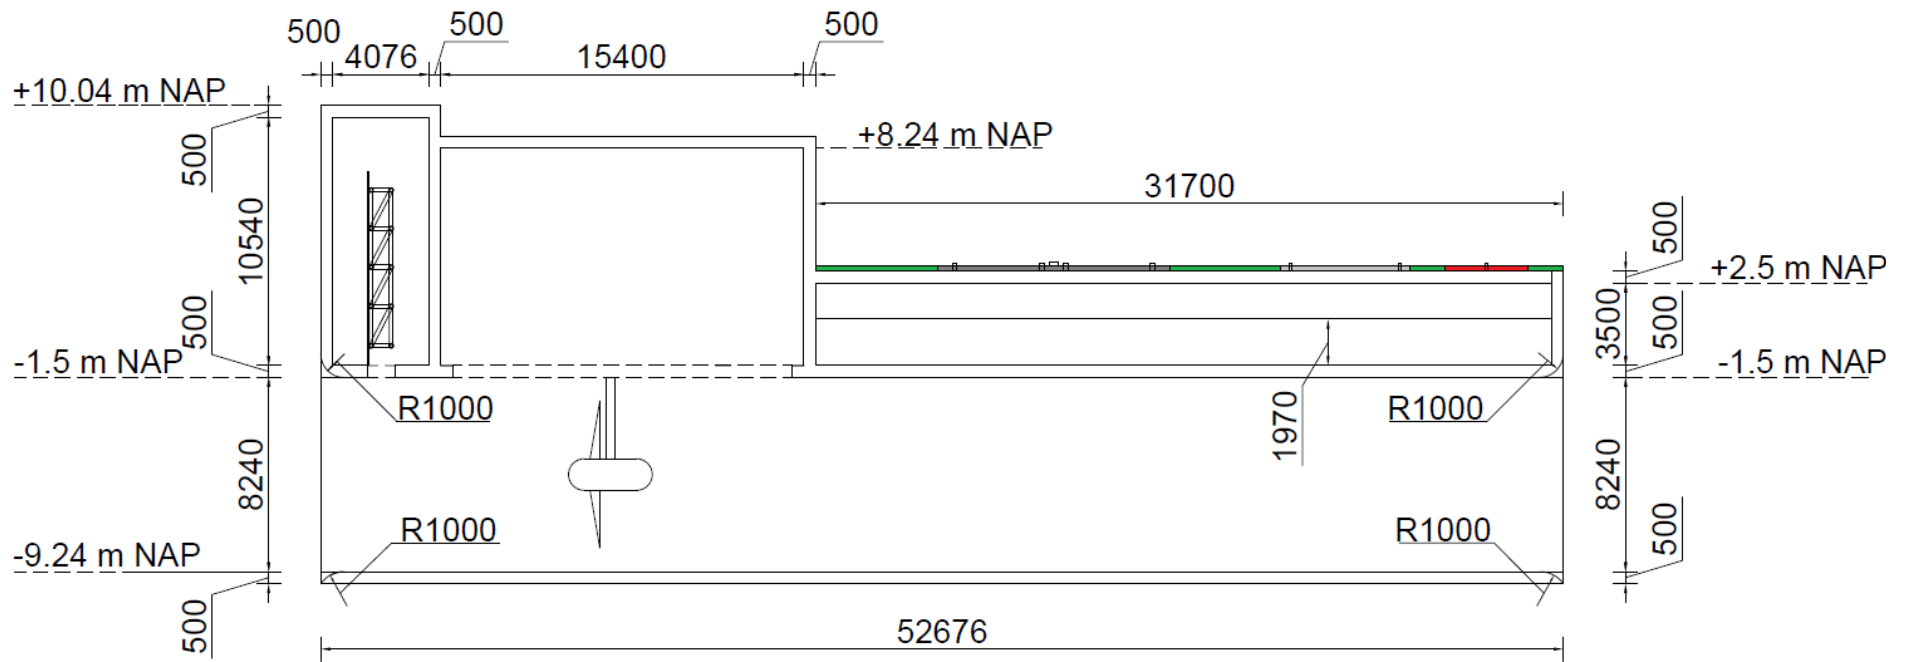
CROSS-SECTION PRELIMINARY POWERHOUSE DESIGN INCLUDING BALLAST LAYER (1.97 METER) UNDERNEATH INFRASTRUCTURE
